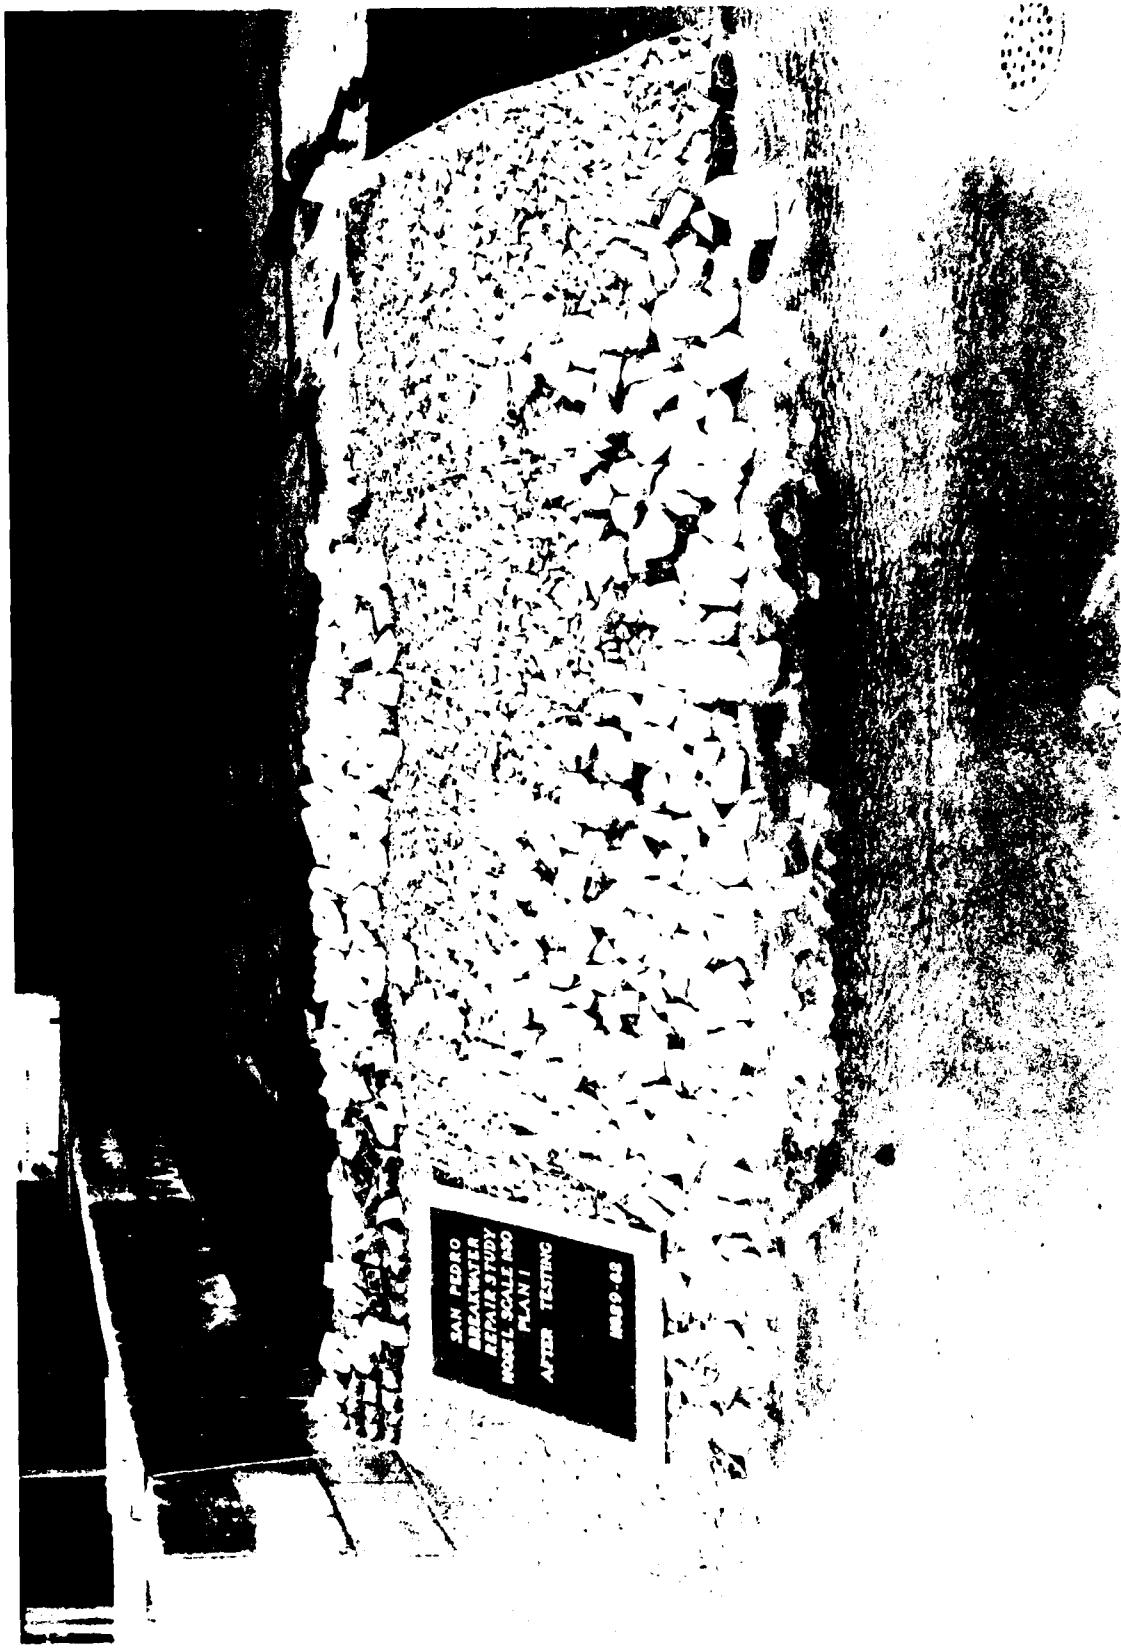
Sea-side view of Plan 1 after testing with Hydrograph B.
